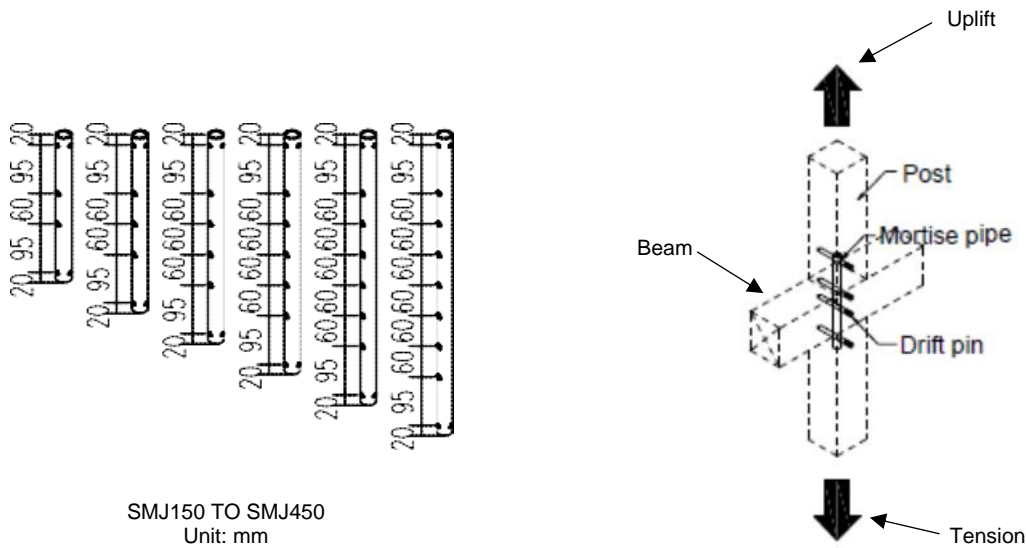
SHAWOOD SMJ MORTISE PIPE CONNECTORS AND POST-TO-POST THROUGH BEAM CONNECTION INSTALLATION (TYP)
